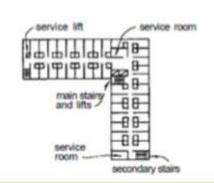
SHOWS LINEAR ROOMS ARRANGEMENT AND T SHAPE ARRANGEMENT.
